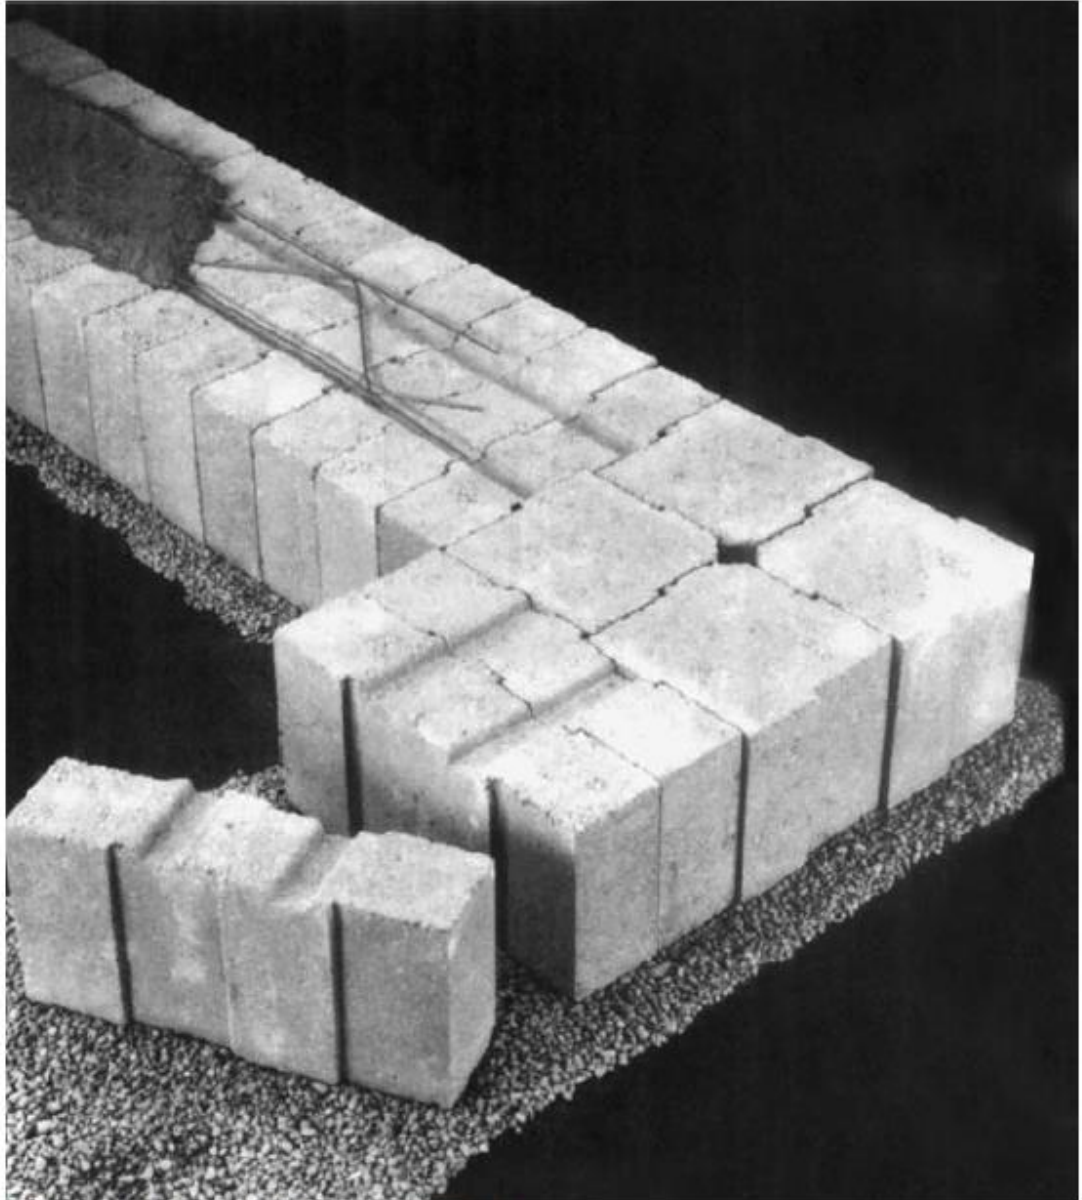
IDR Footer—Blocks. *(Courtesy National Concrete Masonry Association)
